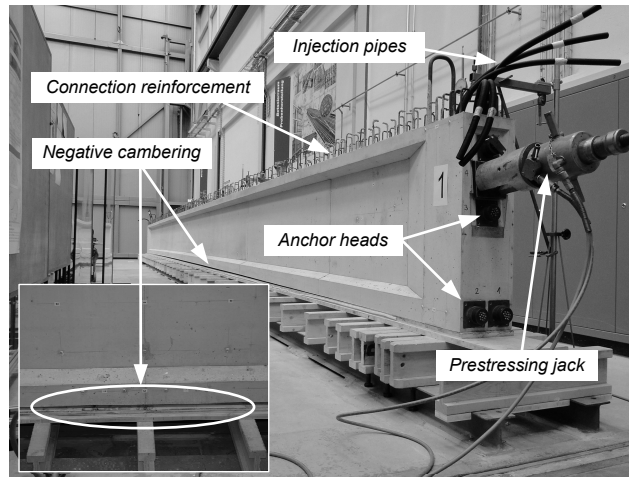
Casting and prestressing of the prestressed concrete girder(s) (images by Julien Michels)
